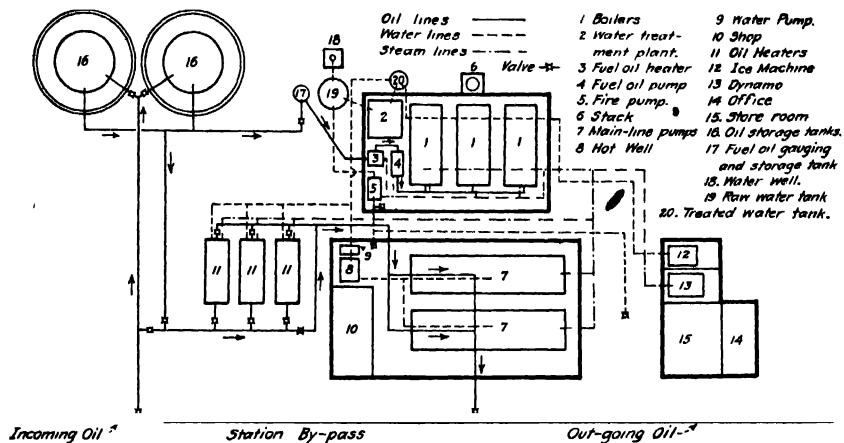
Diagrammatic lay-out of a typical steam-driven trunk pipe line pumping station.
